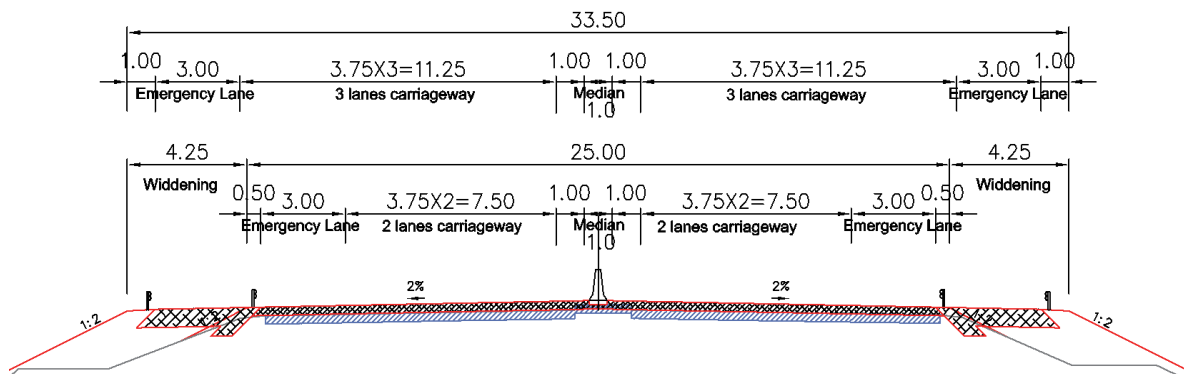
Widening to 6 Lanes Standard Cross Section
